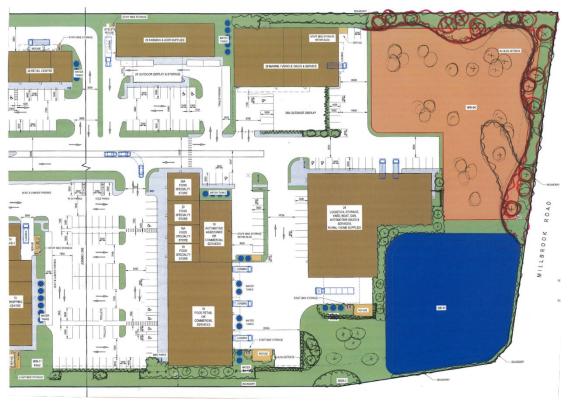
Sketch plan prepared by NK Landscape Architecture - October 2023
